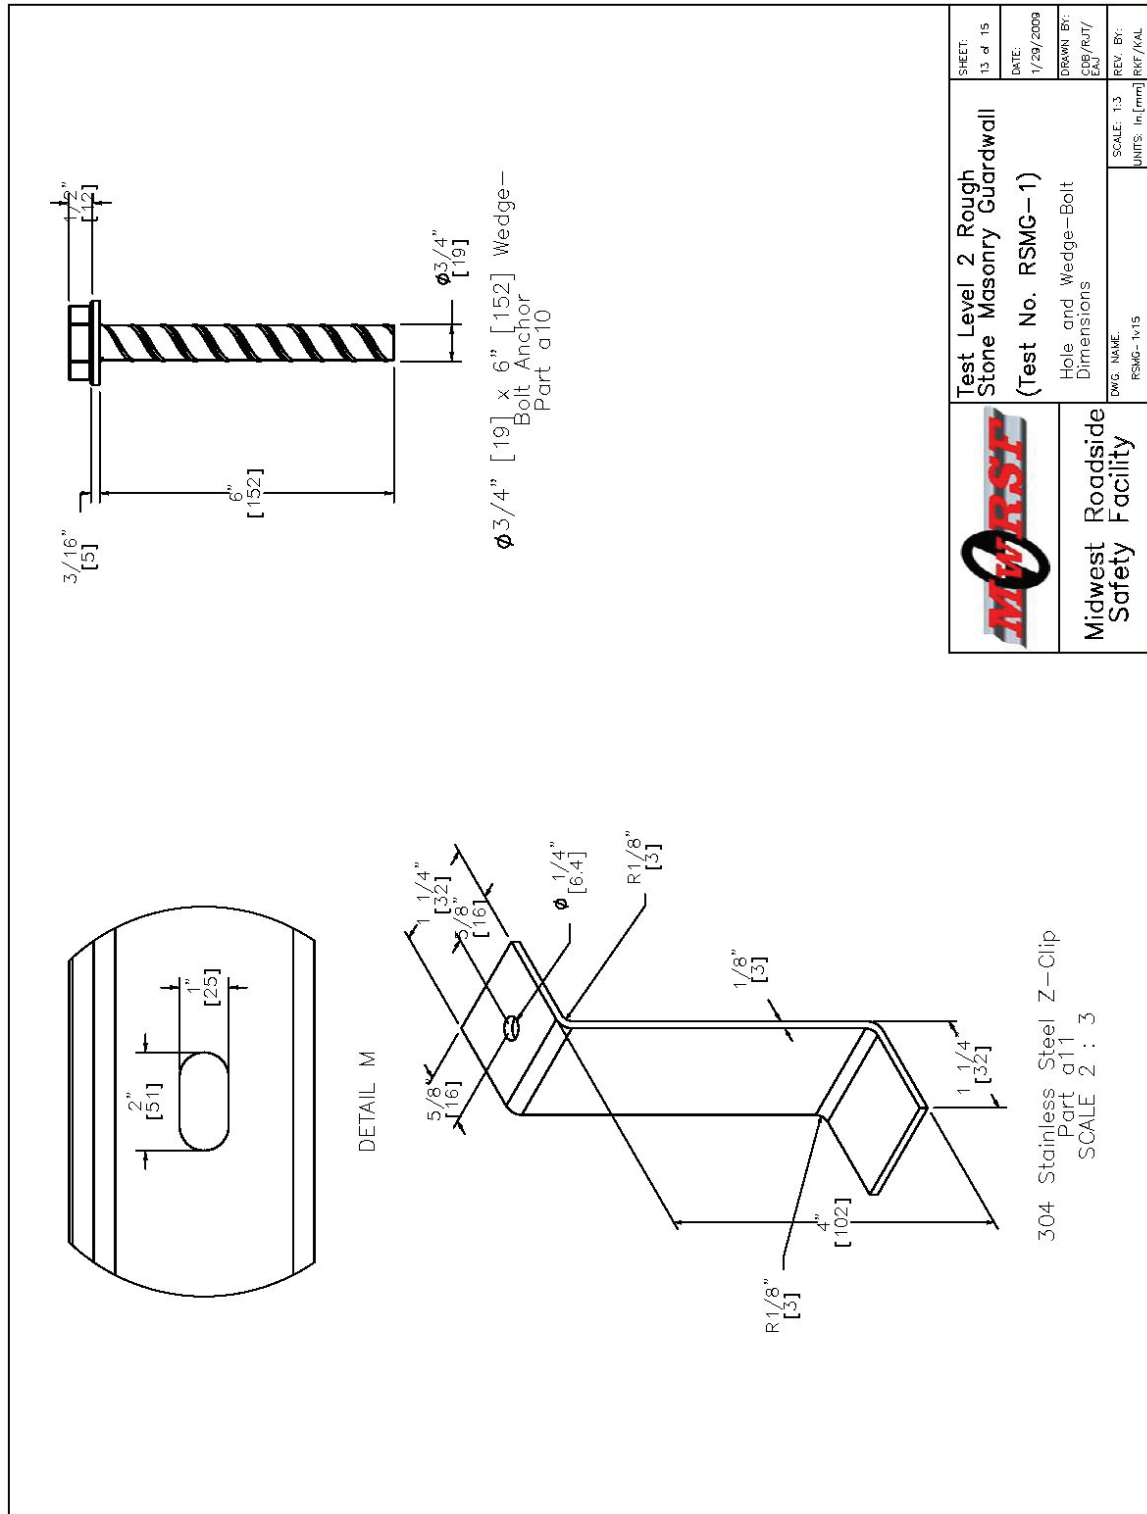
Angle Slot, Z-Clip Bracket, and Wedge-Bolt Screw Anchor Dimensions, Test No. RSMG-1
